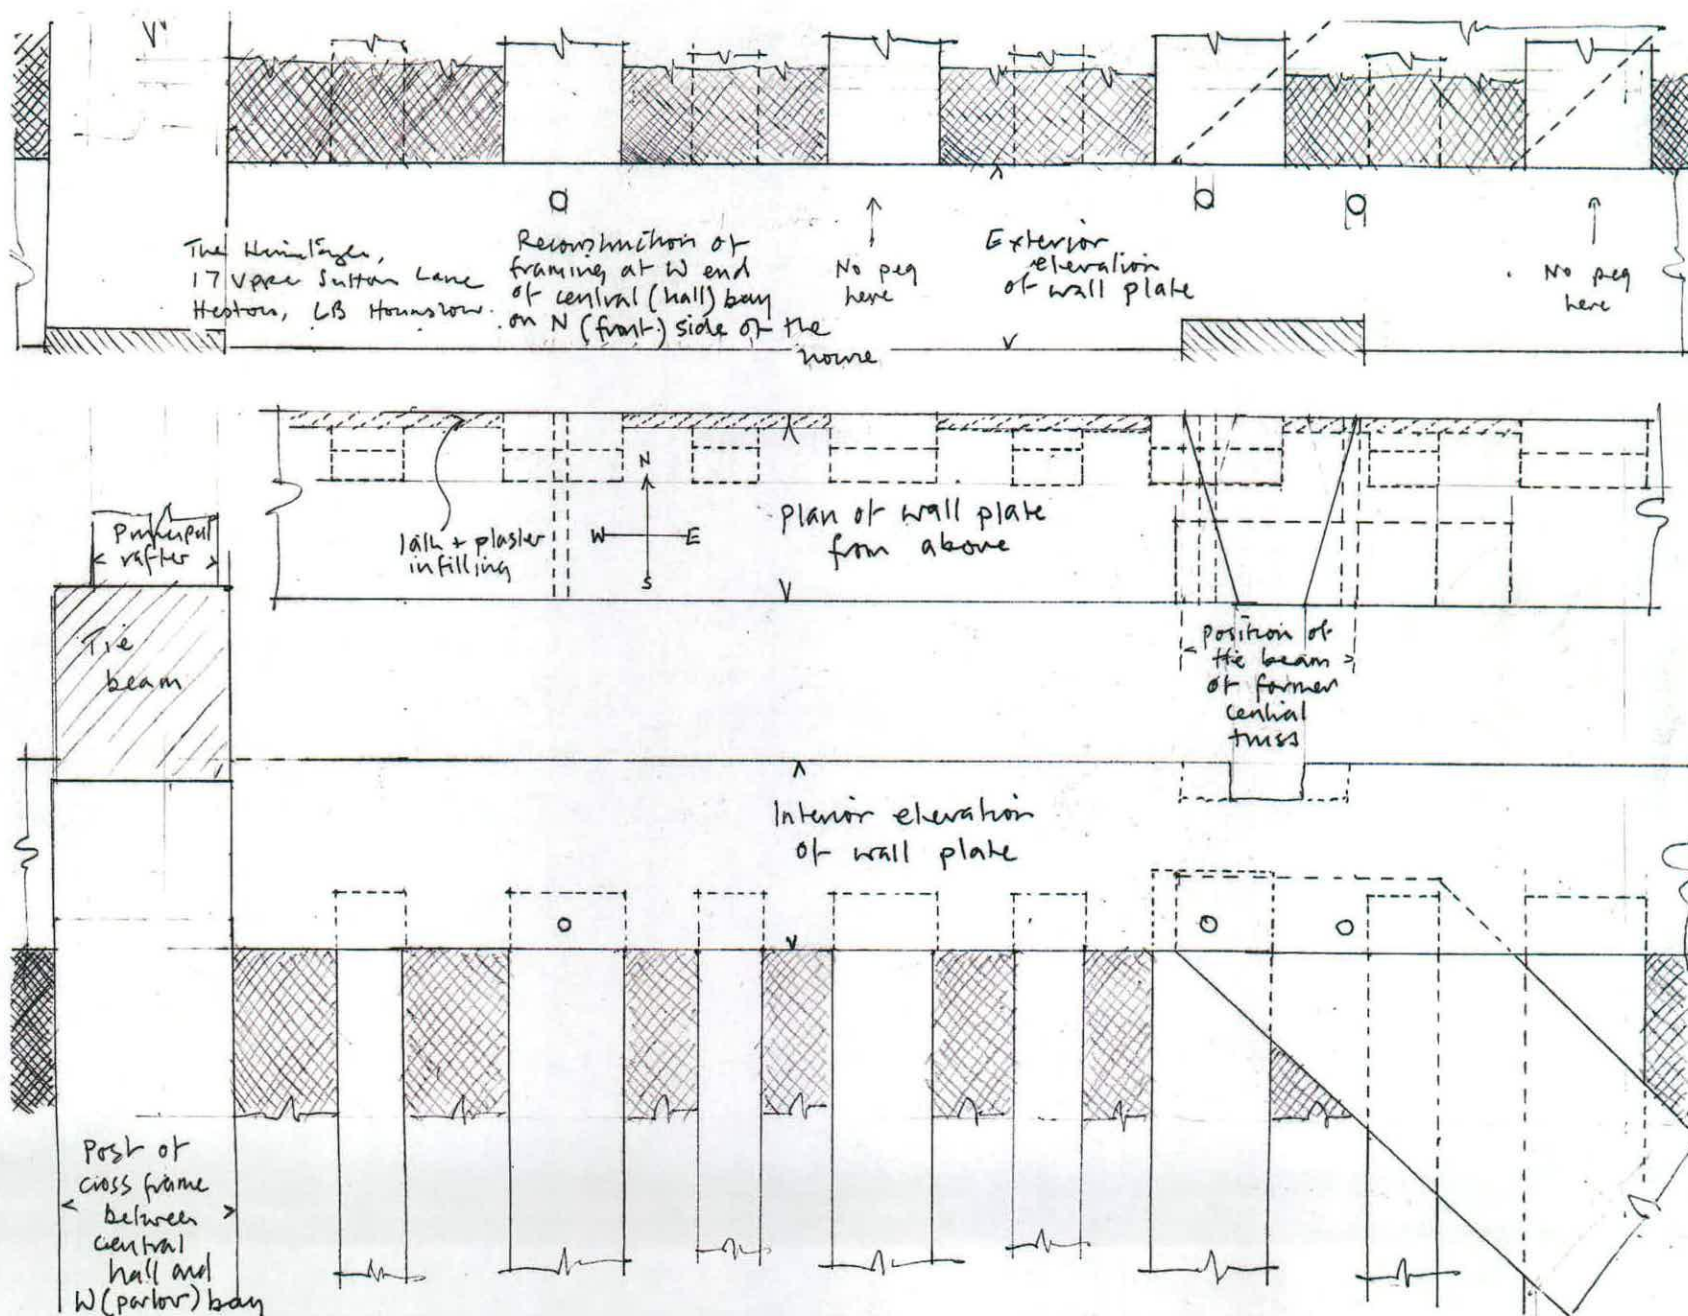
Sketch showing method of wall construction on front (N) wall of central hall bay
